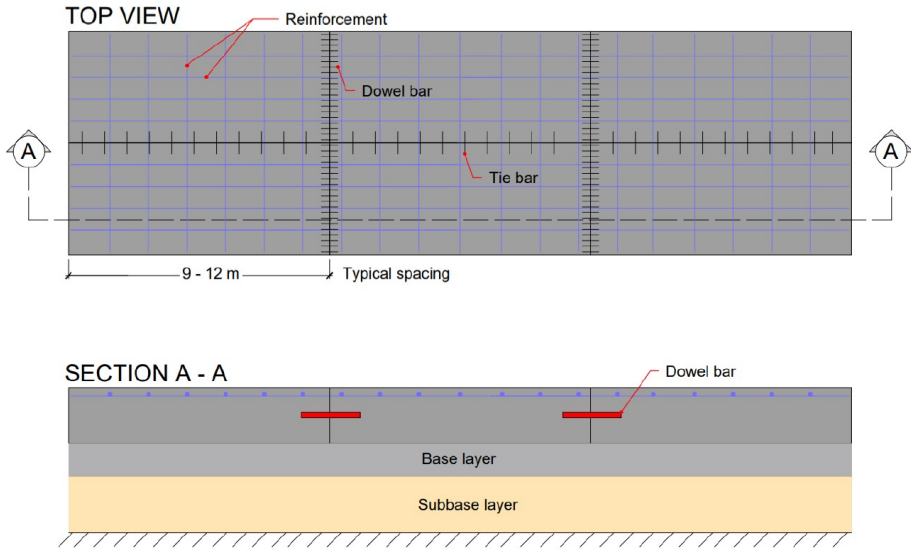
Top and sectional view of joint reinforced concrete pavement.
